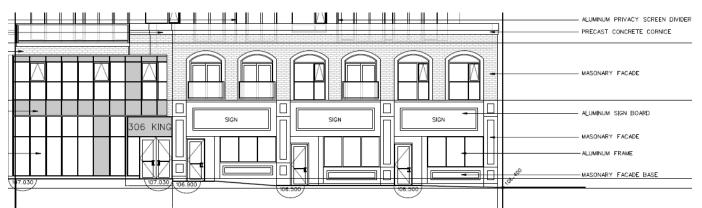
Detail of proposed front (south) elevation podium. (Source: Arsenault Architect Inc., 2025)
